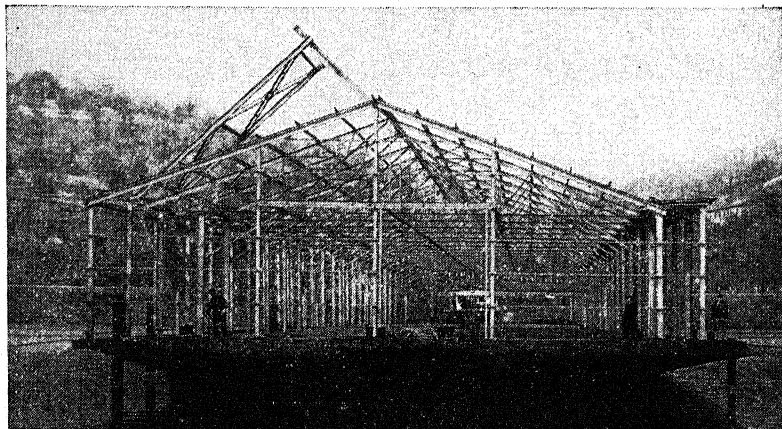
End elevation of arc welded wharfbarge showing superstructure.
